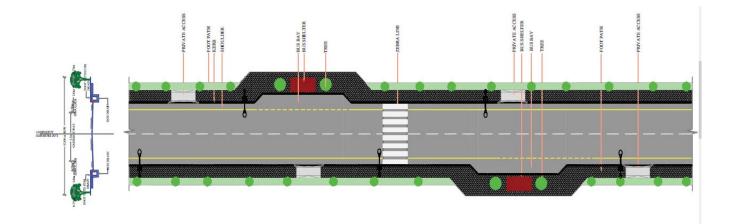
Typical layout of 12m Right of way with 5.5m carriageway
